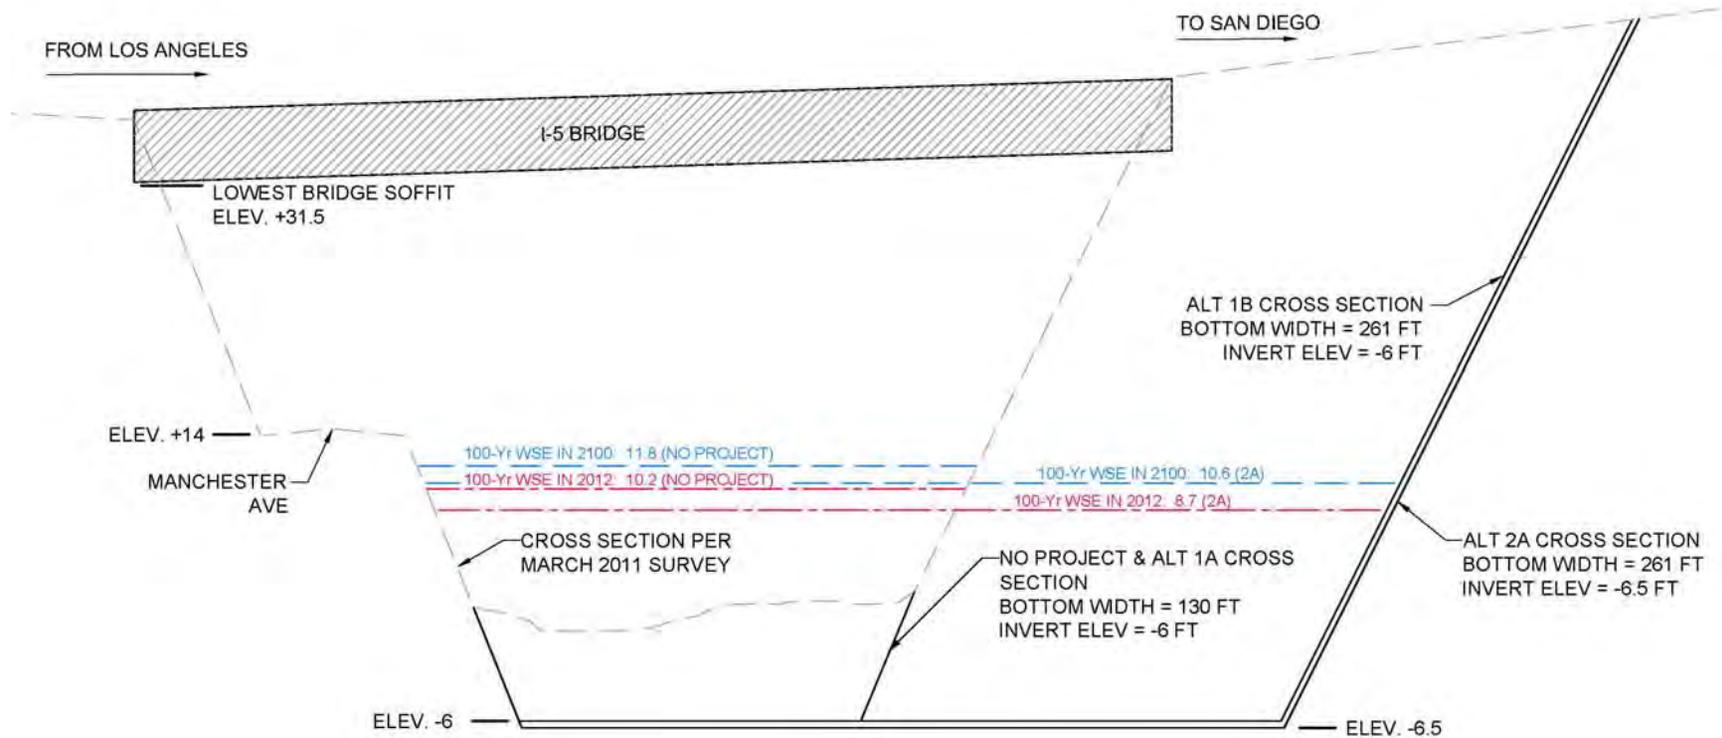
Existing I-5 Bridge Channel Cross-Section
